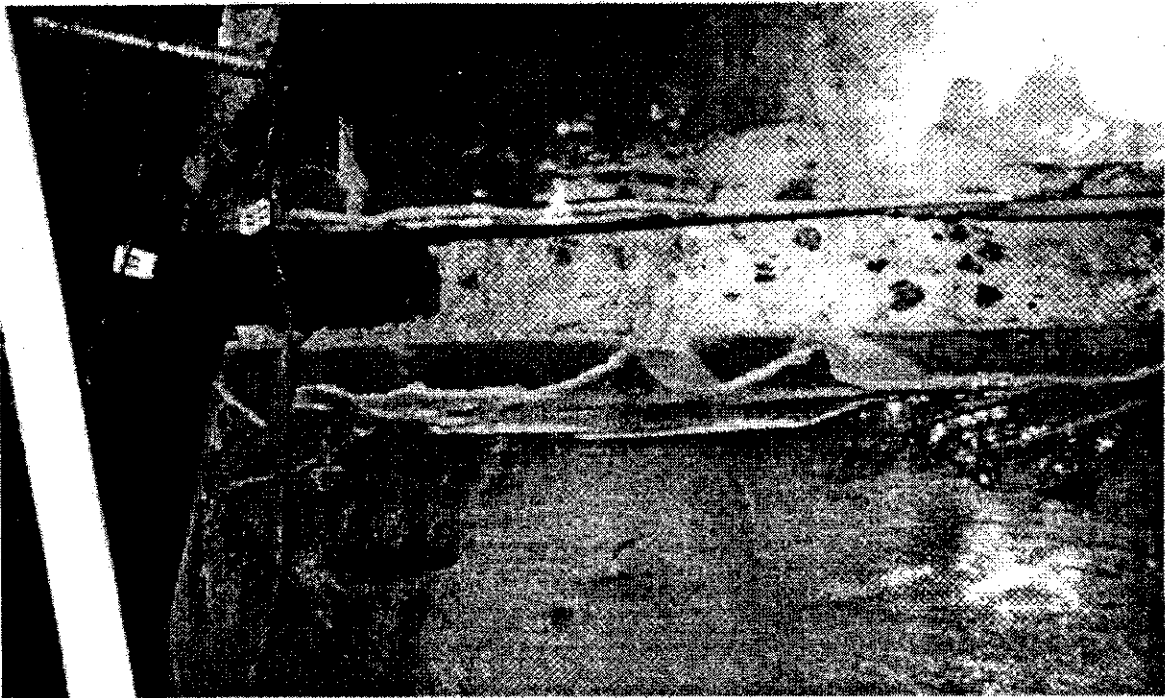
Specimen FR, Run 8, Spalling
